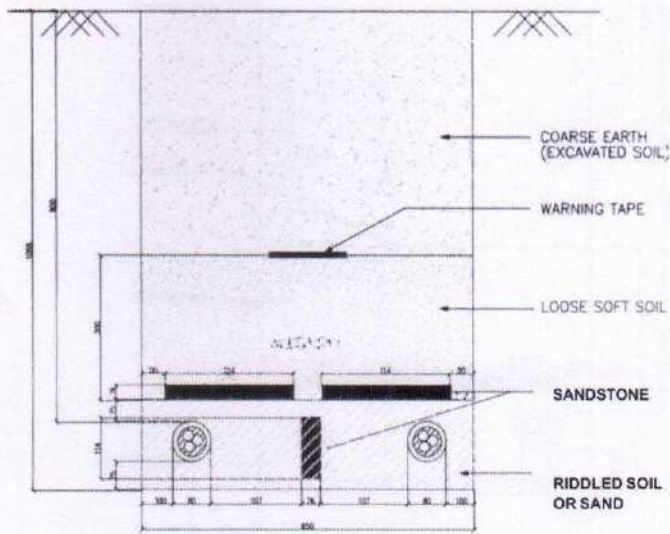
1.1kV, 300sqmm Buried Cable
